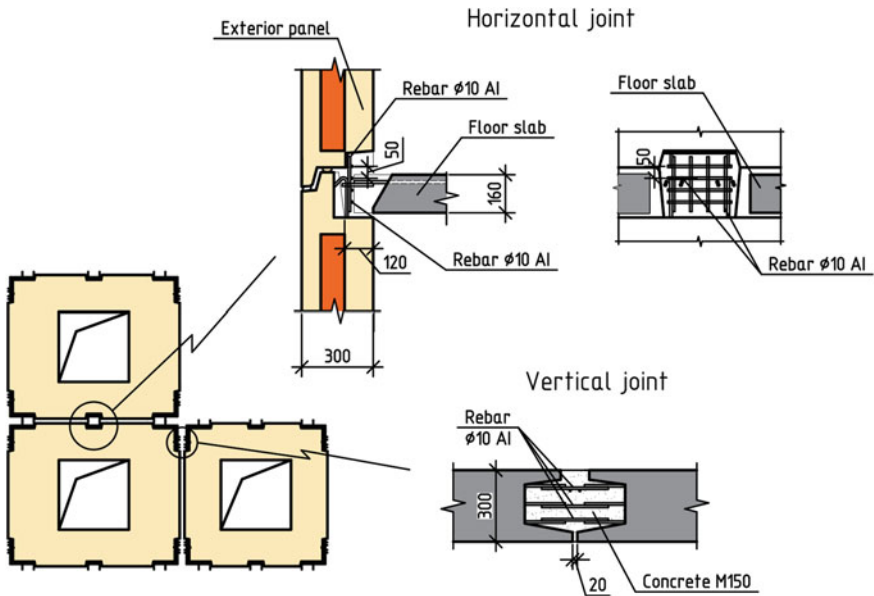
Details of large panel precast building (building system “Seria 1.464s”)
